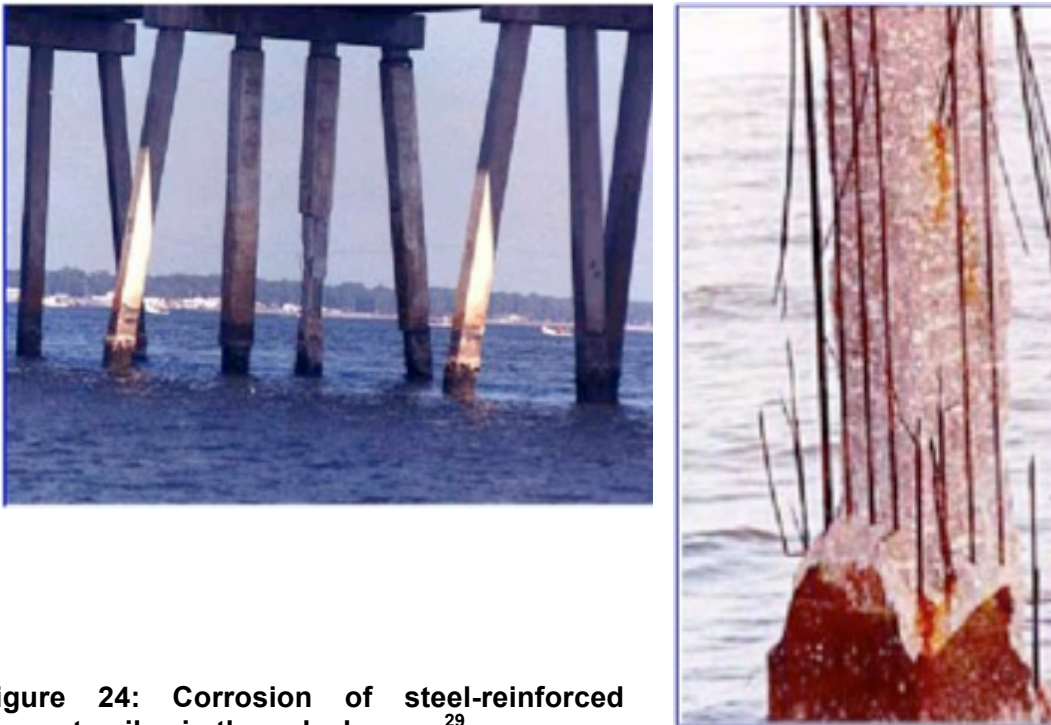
Corrosion of steel-reinforced concrete piles in the splash zone.²⁹
